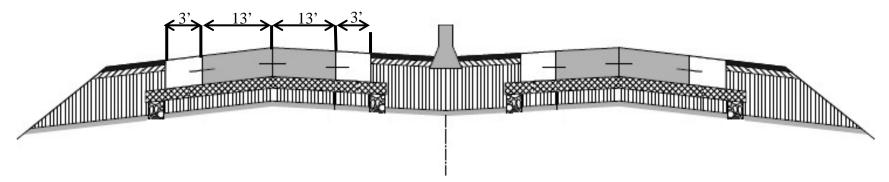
Type I-A, Type I-B and II concrete general structural design – sectional view.
